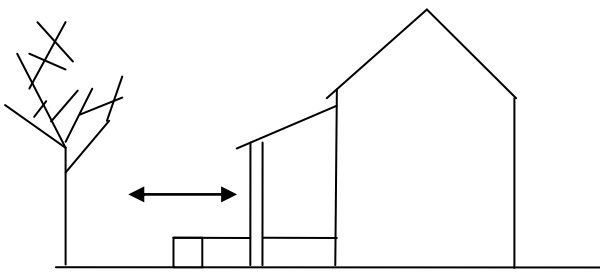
Low walls on front boundaries to retain the visual connection to the street
